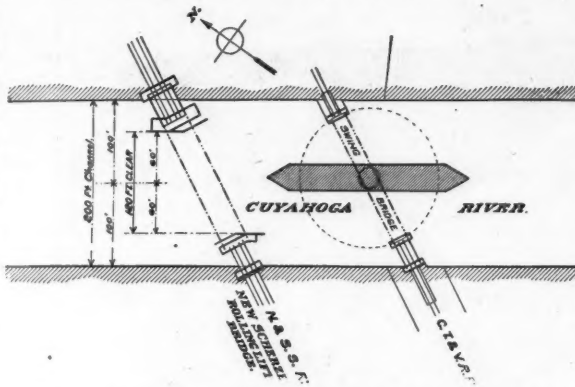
Location Plan of Scherzer Bridge at Cleveland.
